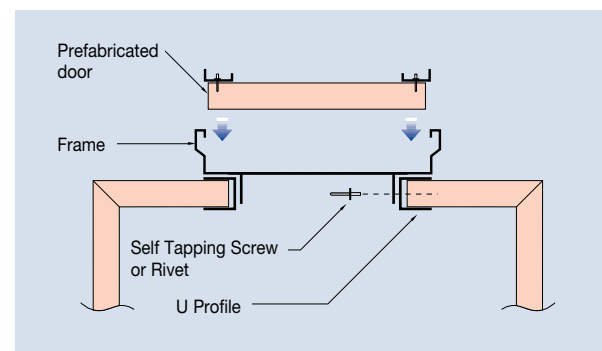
Fitting Insulated Pre-fabricated Access Doors
